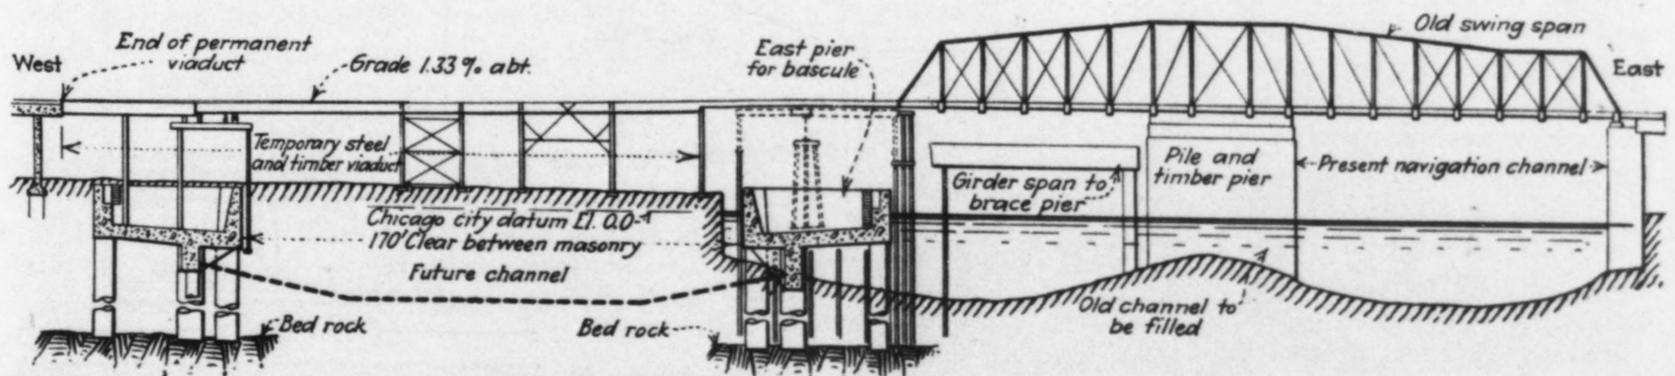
LOCATION OF OLD AND NEW BRIDGES
